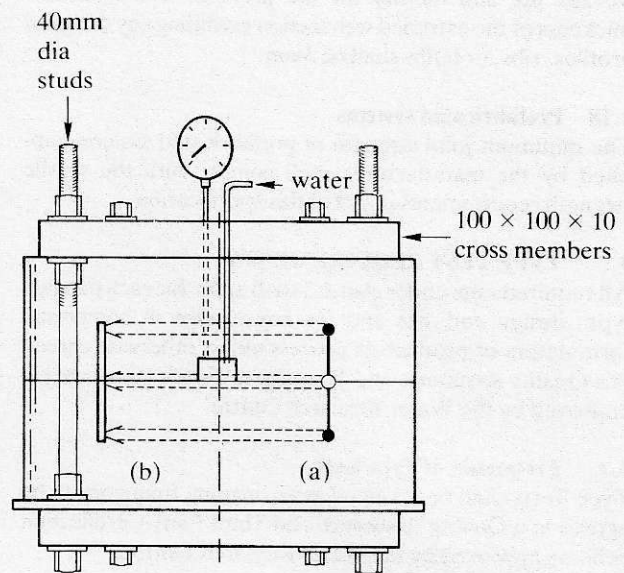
Elevation and section of test specimen incorporating either (a) integral or (b) surface type waterstop.
